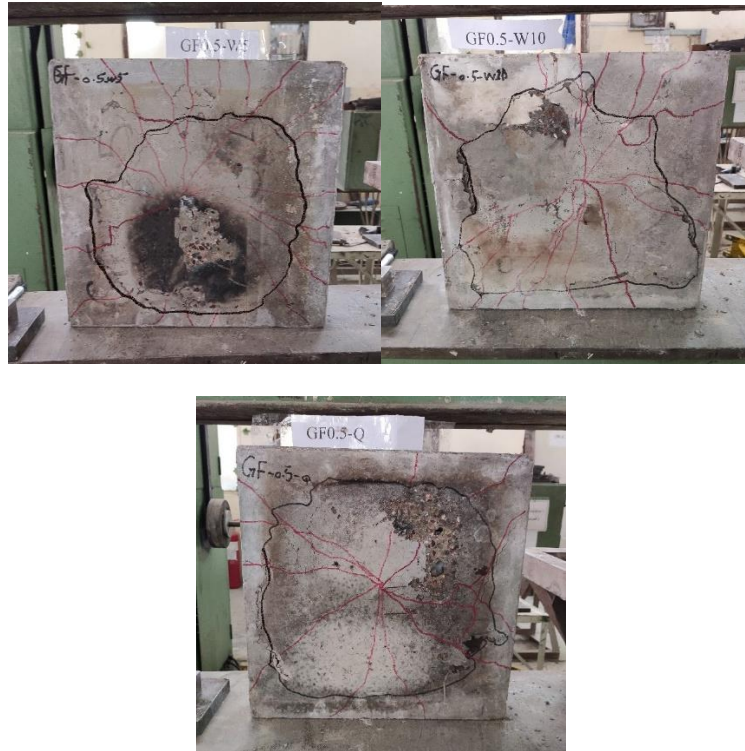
Crack Pattern and Punching Perimeters of 0.5% Glass Fiber Concrete
